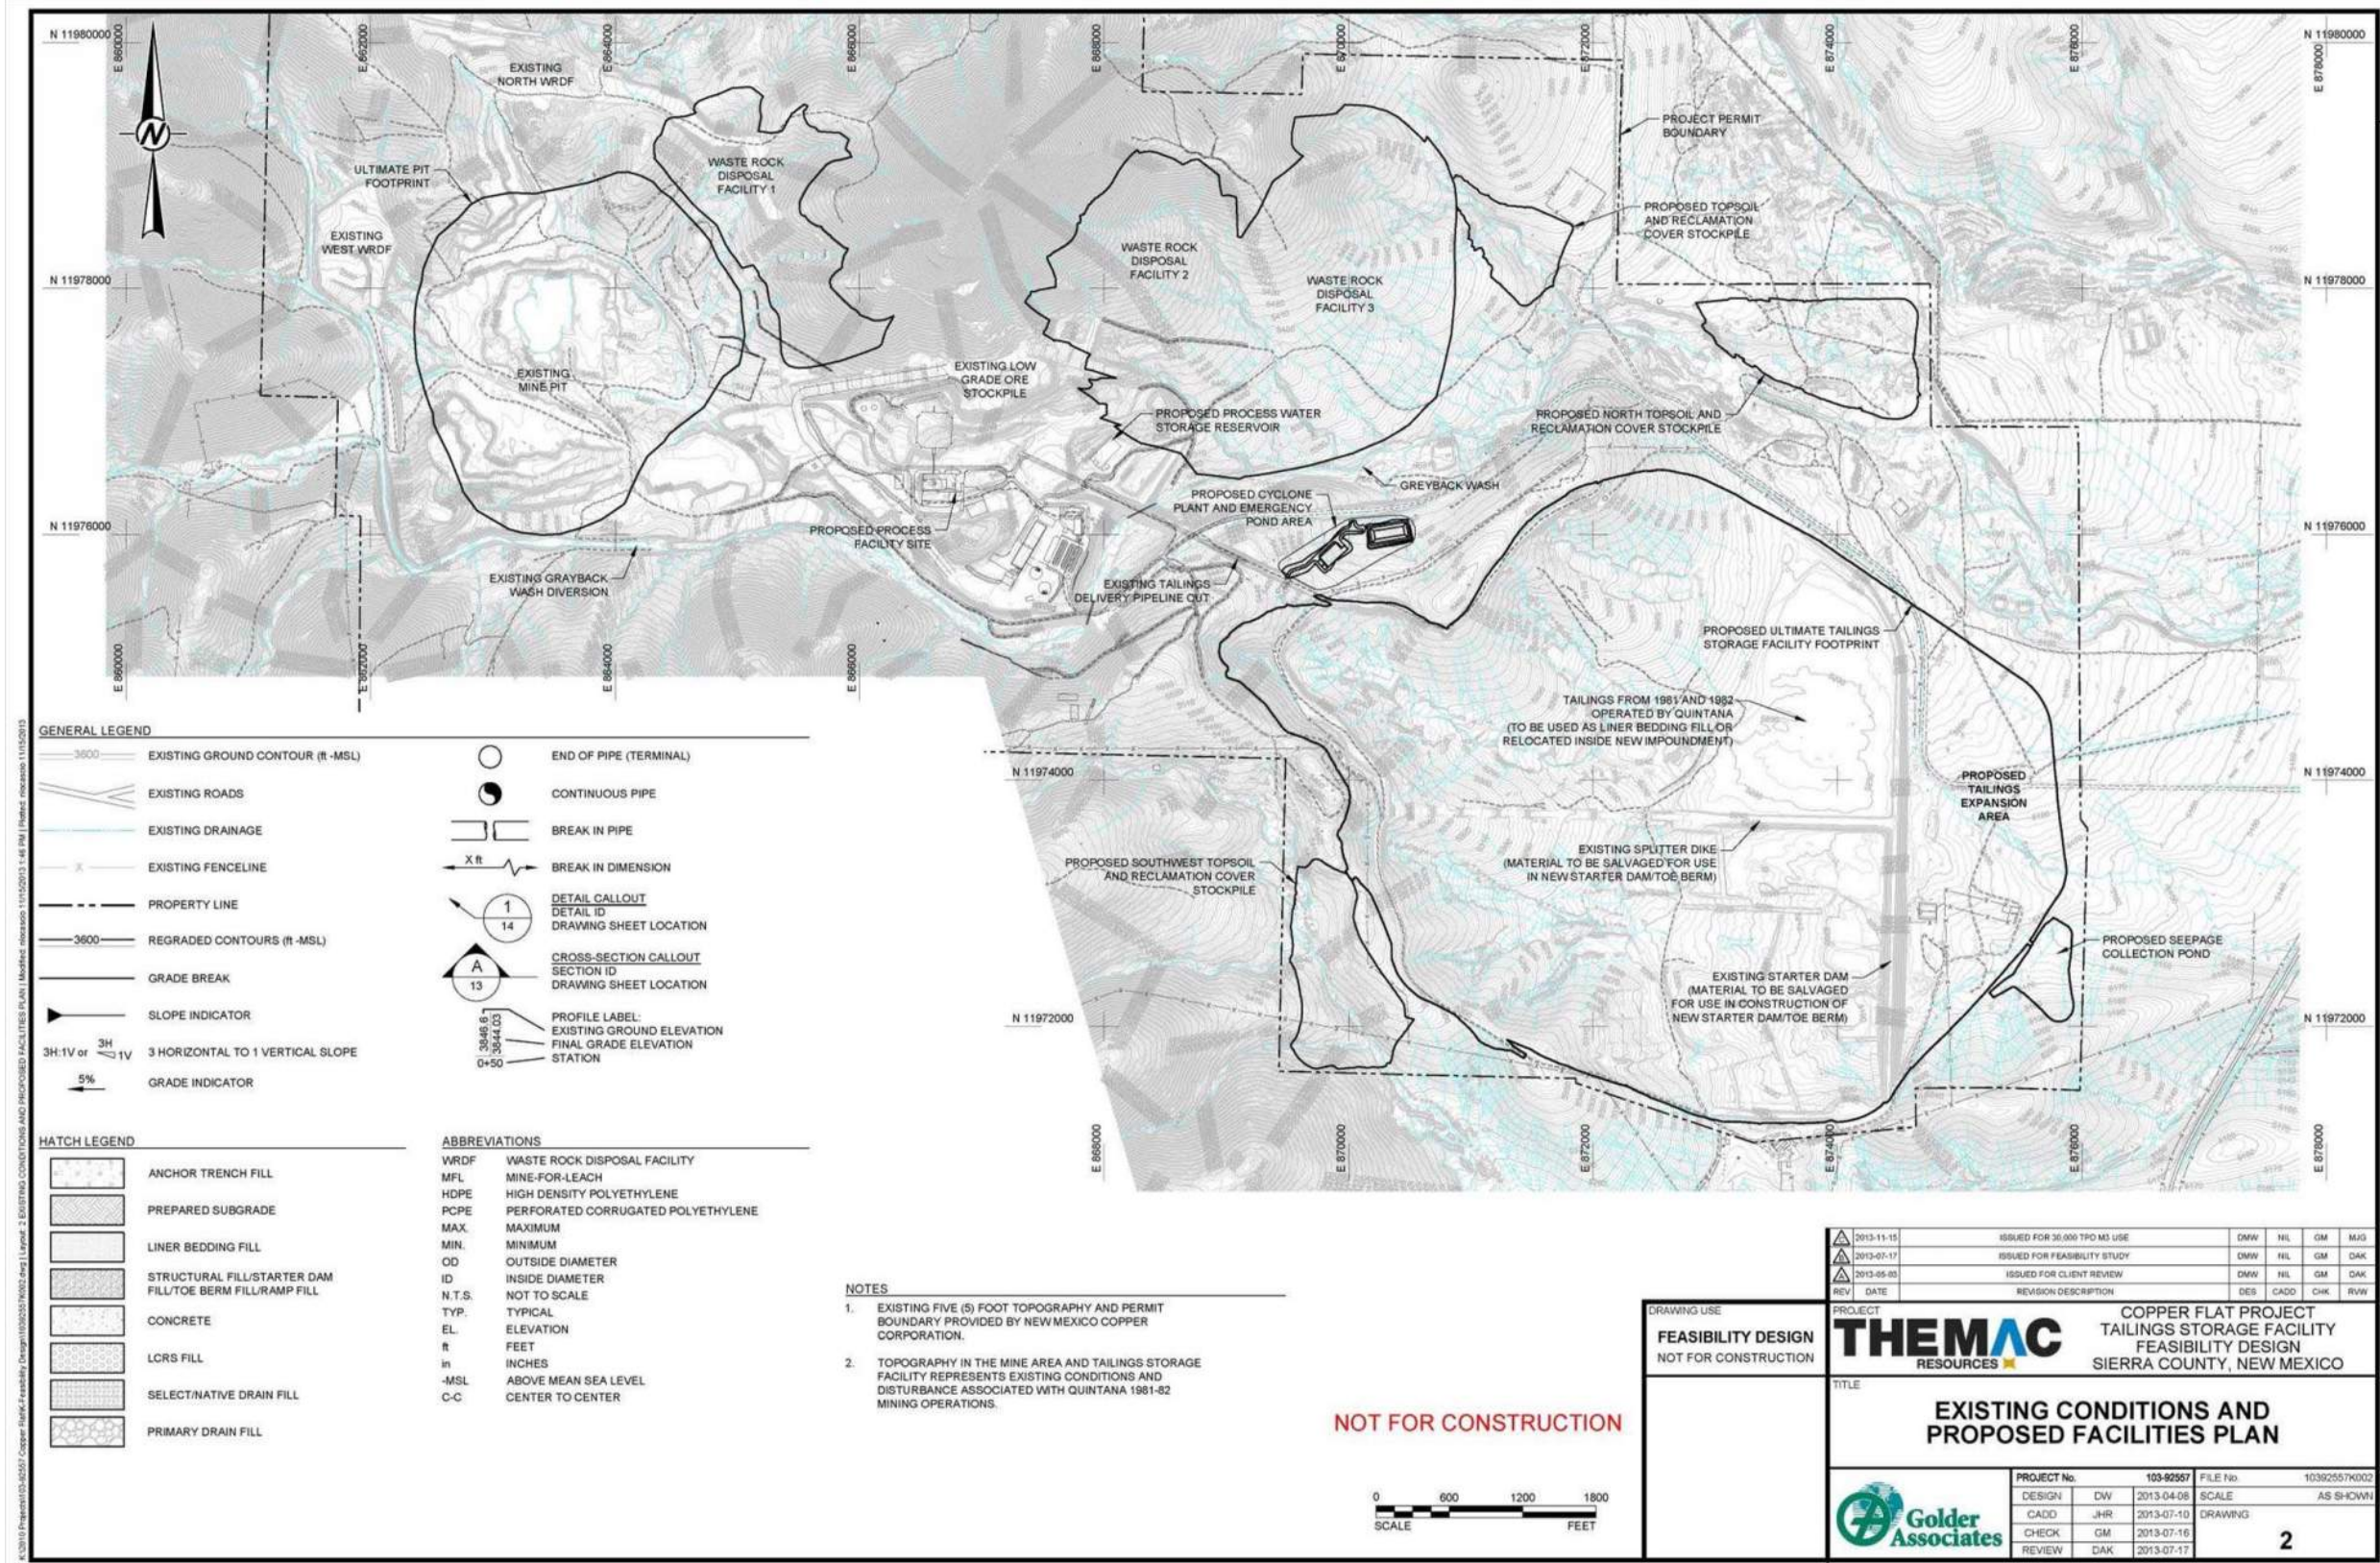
Existing Conditions and Proposed Facilities Plan
